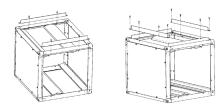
Mount flanges to inlet and outlet. (3-ton model shown.)
